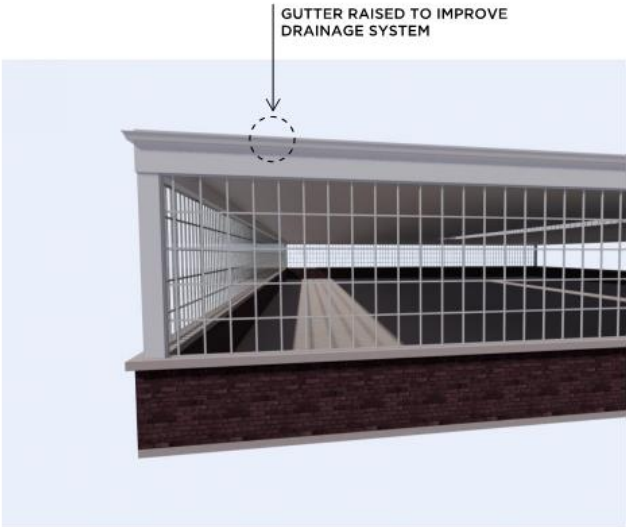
South Building Elevation. Raised curb is inset to not be visible when viewing building from grade level.
